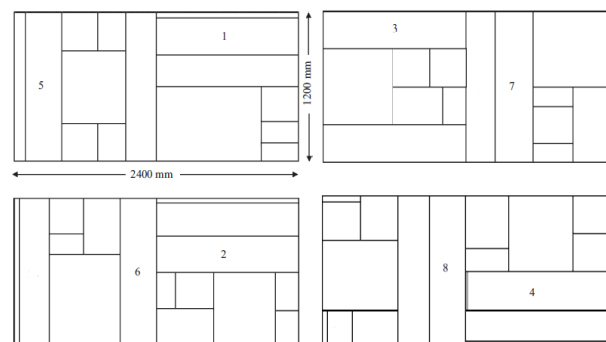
The cutting plan shows on a sample of four panels for sampling of specimens according to EN 789. Test specimen no.1 to no.4 is longitudinal grain direction while test specimens no.5 to no.8 is transverse grain direction
